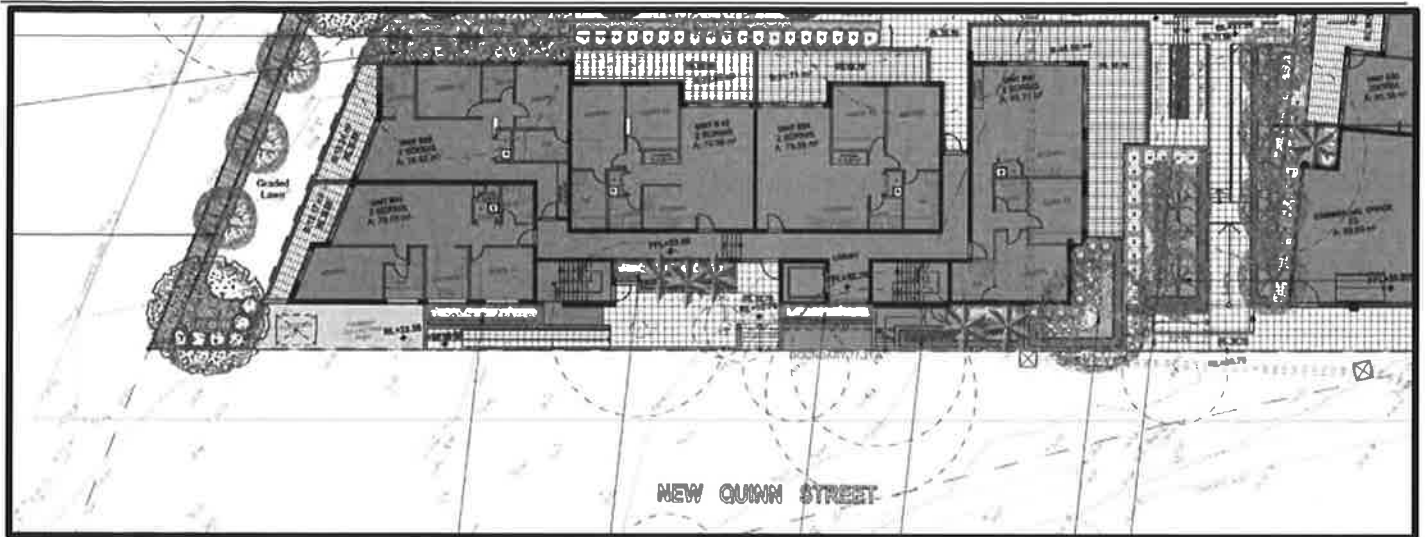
Extract Landscaping to New Quinn Street (Drawing LPDA 14-132/1)
